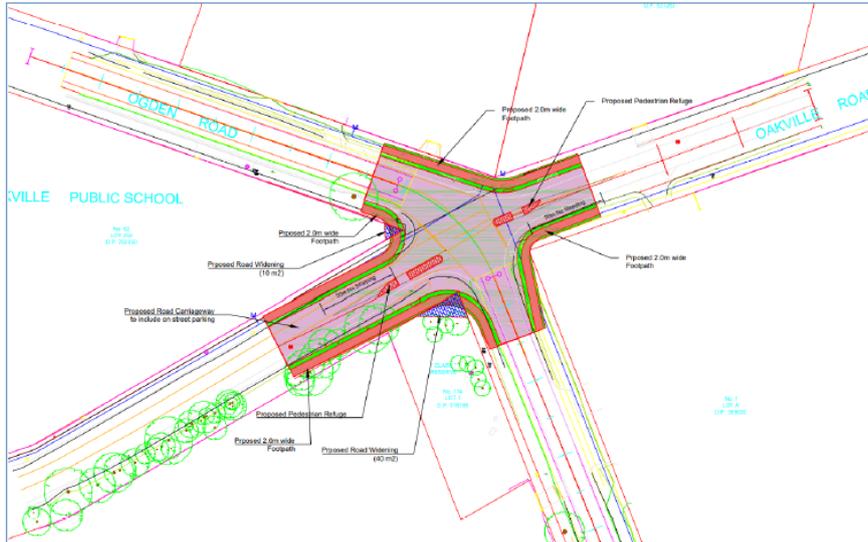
Australian Government Blackspot Funding - Design of Proposed Revised Intersection Upgrade Measures
